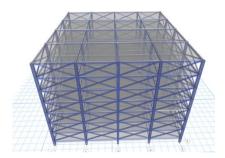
G+6 Building with Full X-Bracing on outer Peripheral walls
